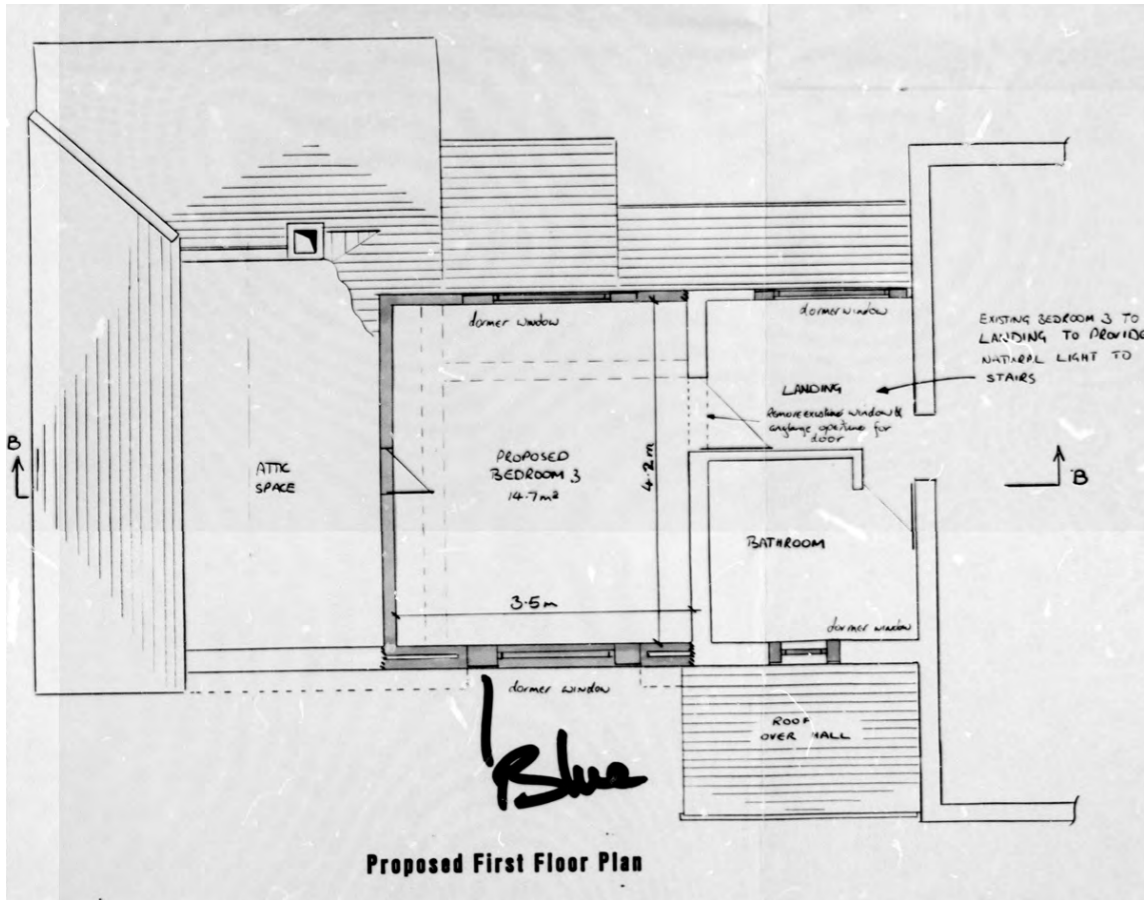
Previous approval REF: 82/P/0425 - Proposed first floor plan (NTS)
